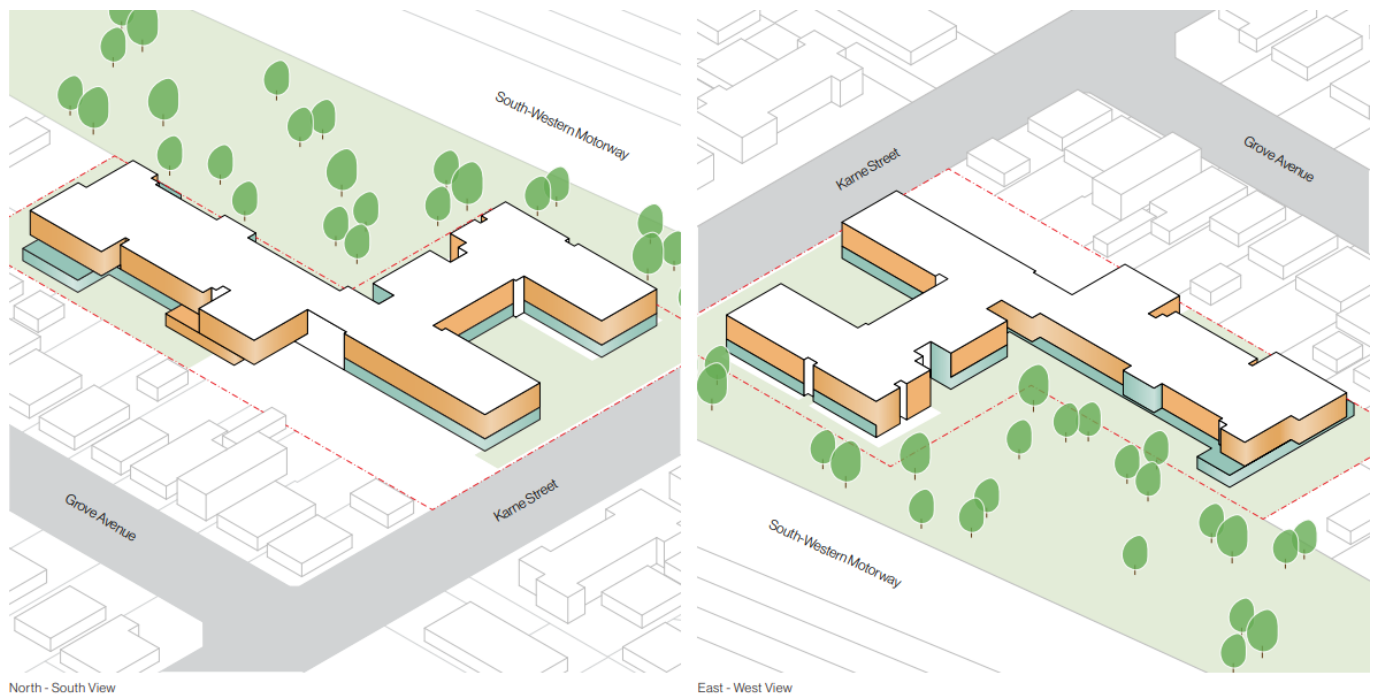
Proposed building massing and concept (viewed towards the south east (left) and towards the north west (right))
